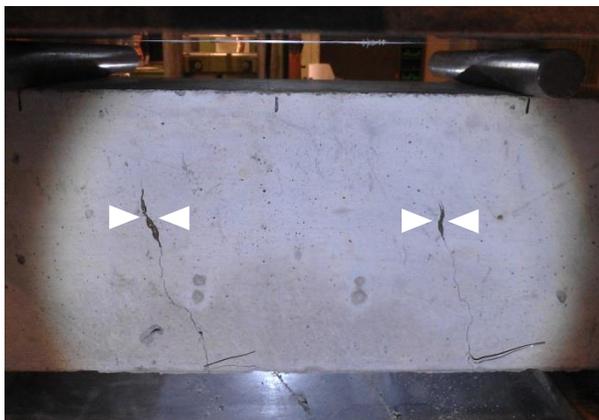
leaking of healing agent (between arrows) during cracking of a concrete specimen under 4-point bending.
